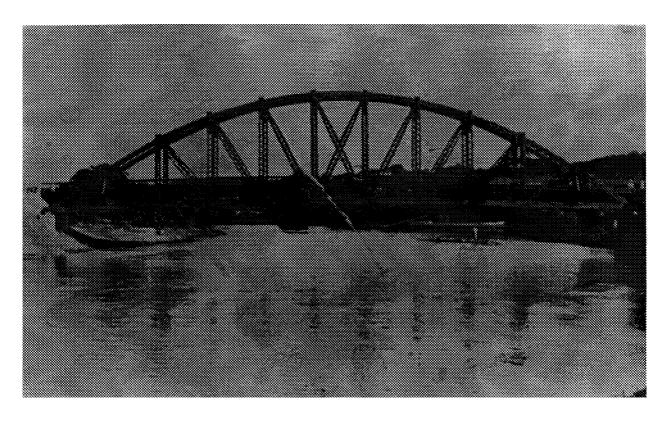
Bowstring truss bridge over Tiete river. This bridge was 52 meters long, consisted of two longitudinal bowstring truss beams of Peroba Rosa specie and was built in 1930.
